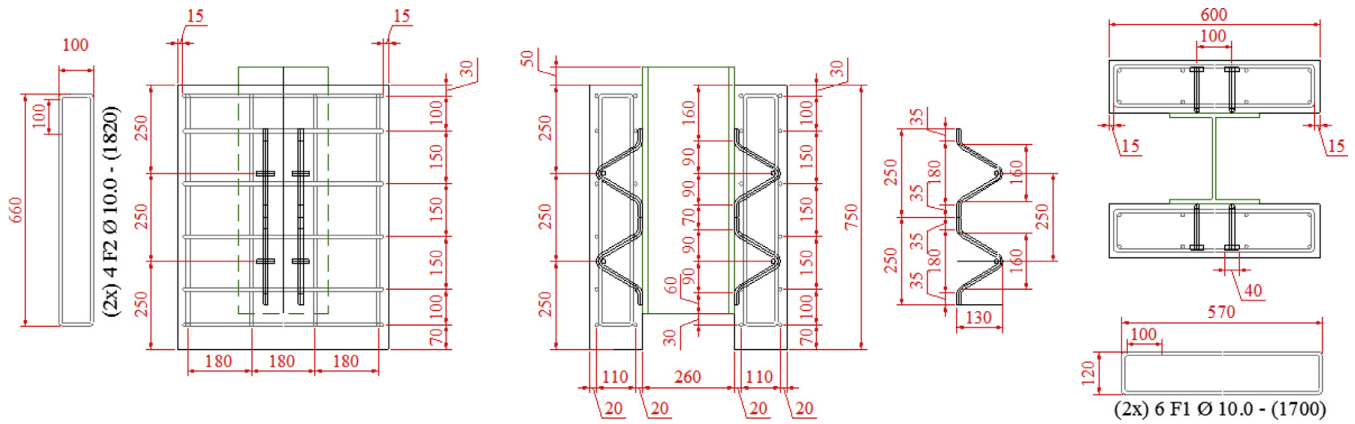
Concrete slab reinforcement bars for the TT-12.5 push-out tests – dimensions in mm.
